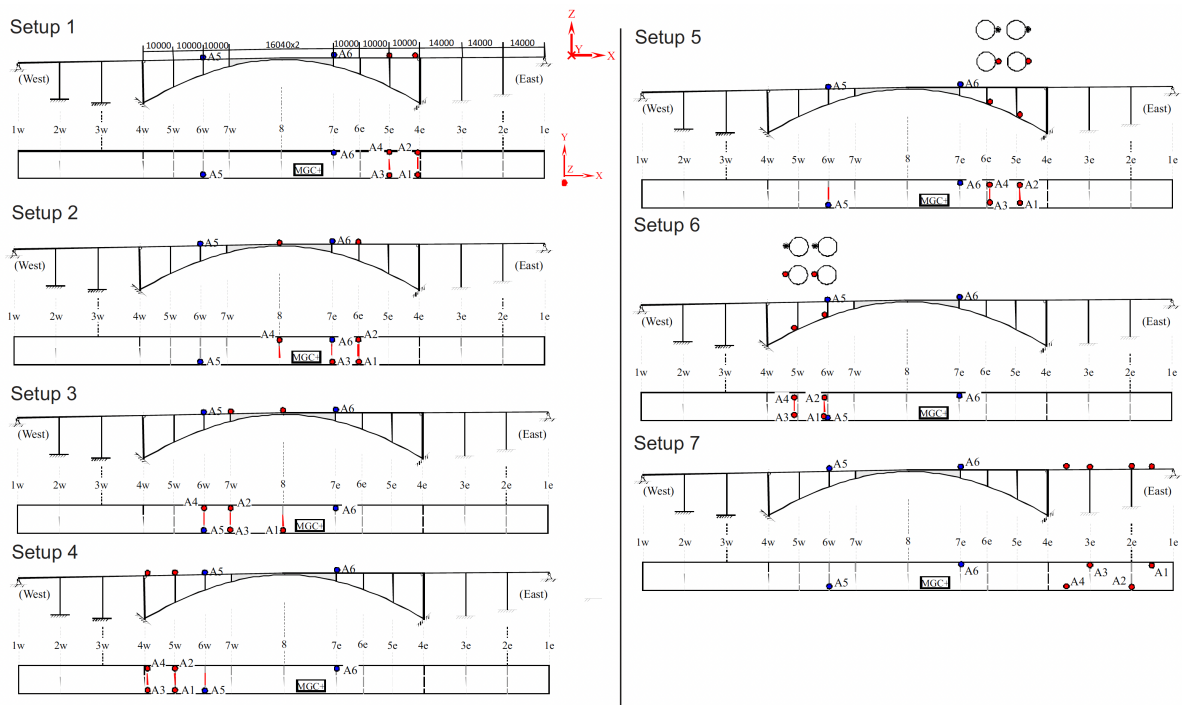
Measurement plan showing the placement of accelerometers for the concrete arch railway bridge across the Kalix river in Långforsen.
